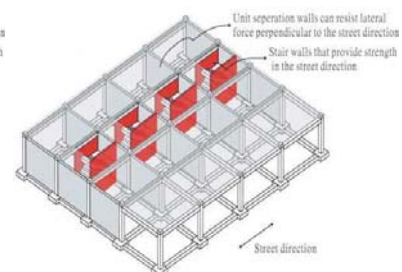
B: Seismic Strengthening (New Construction) - Wall Layout in the Street Direction
